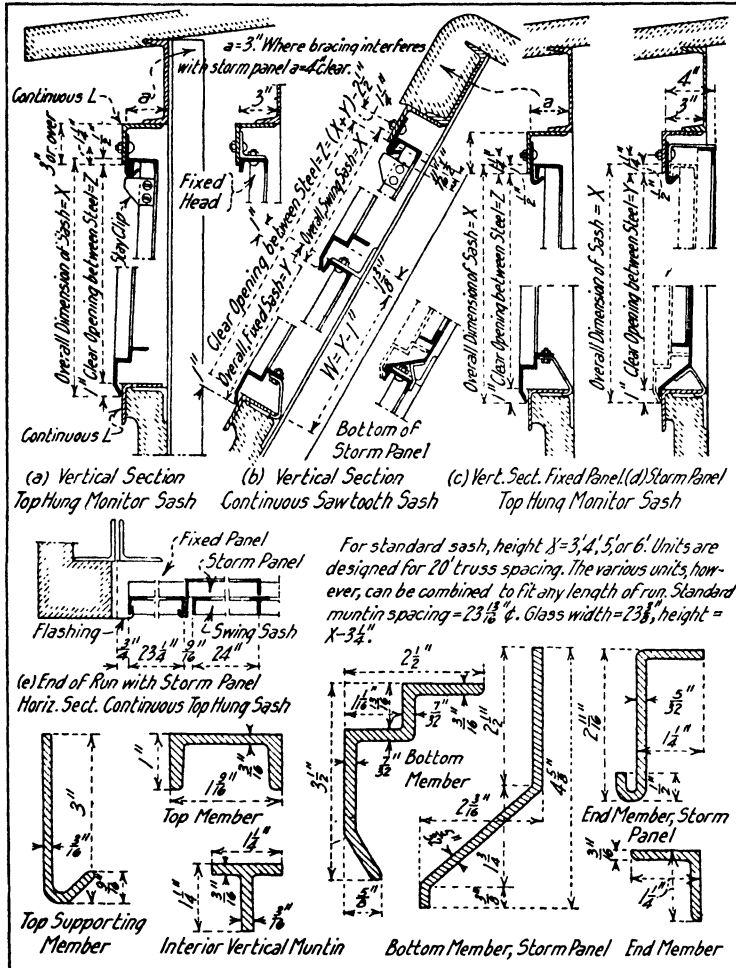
DETAILS OF "UNITED STEEL SASH" VENTILATORS AND SKYLIGHTS.
